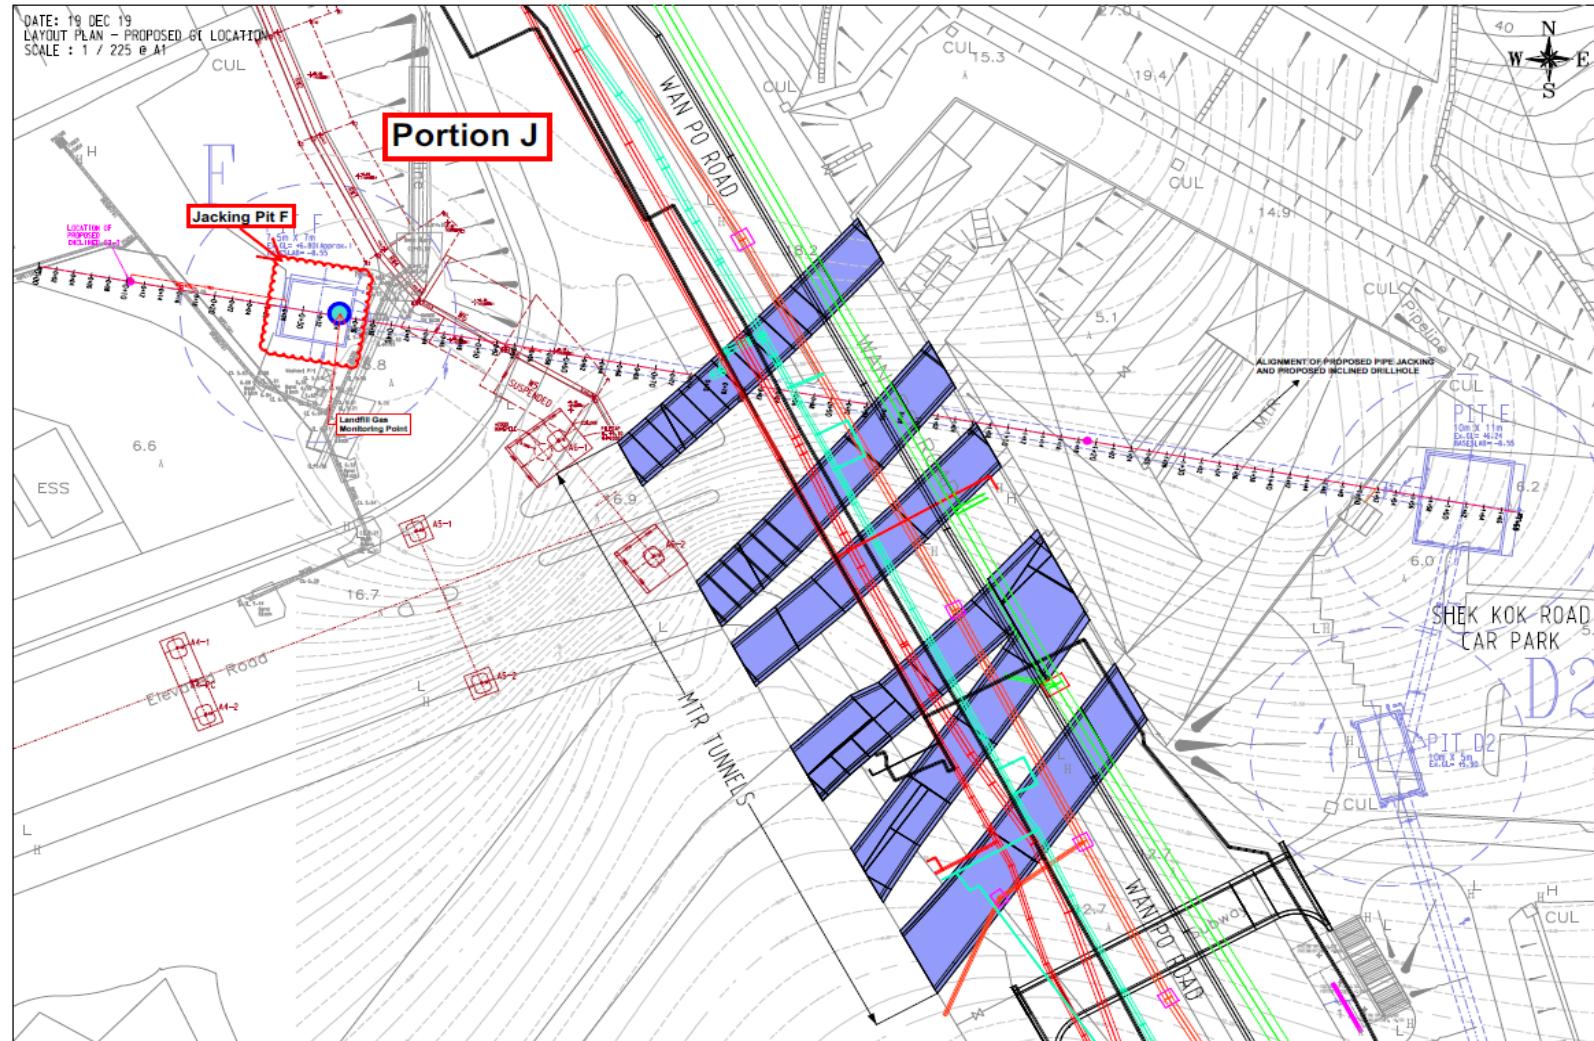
Location Plan for Portion J - Mau Wu Tsai 3 (Po Lam South Road 3)
